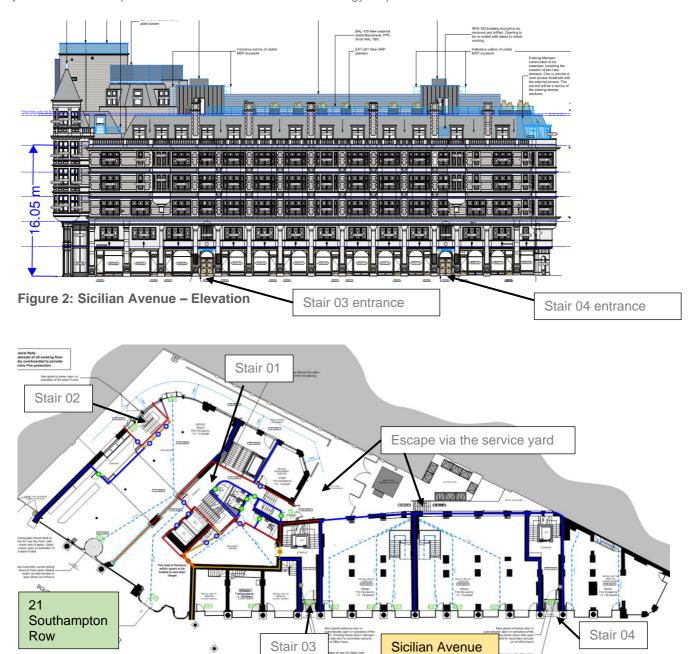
21 Southampton Row and Sicilian Avenue ground floor plan
